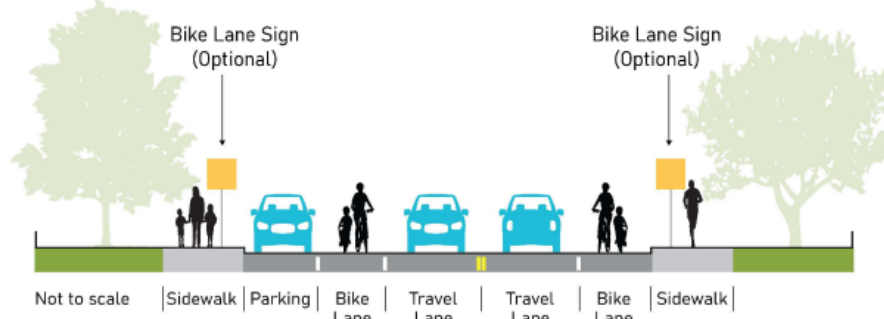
| Facility Types for Wide Sidewalk, Downtown Sidewalk, Bike Lane, and Protected Bike Lane
